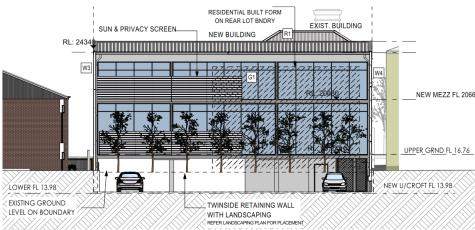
North-east elevation plan of No. 276 Newcastle Street, Perth, showing the previously approved privacy screening.
